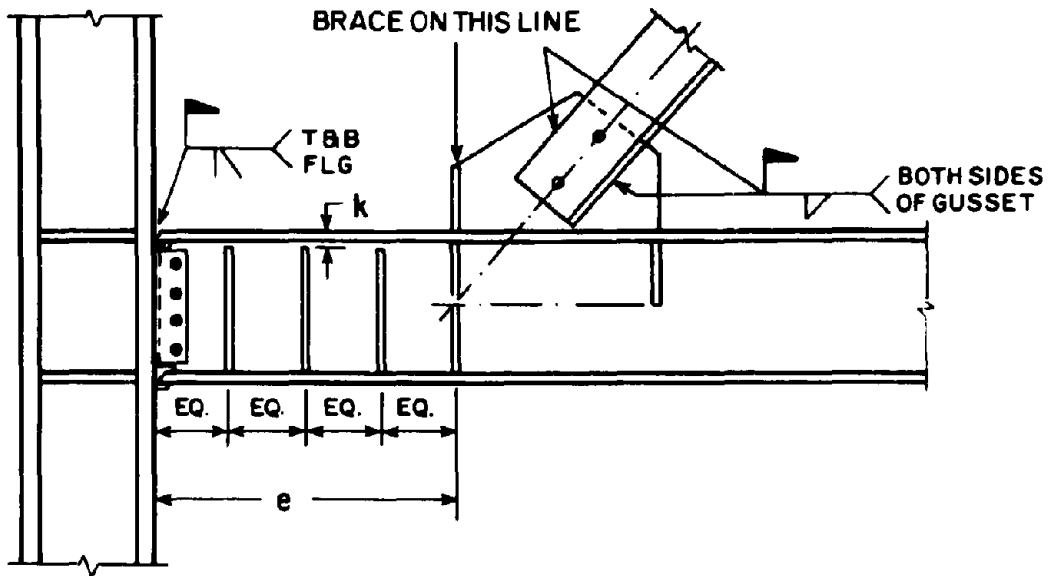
Bolted Web, Welded Flange Link-Column Flange Connection Showing Suggested Stiffener Spacing.
